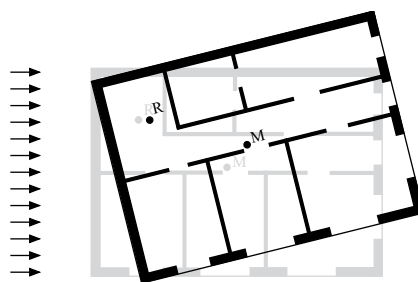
Plan view of corner house and its displacement under horizontal forces
